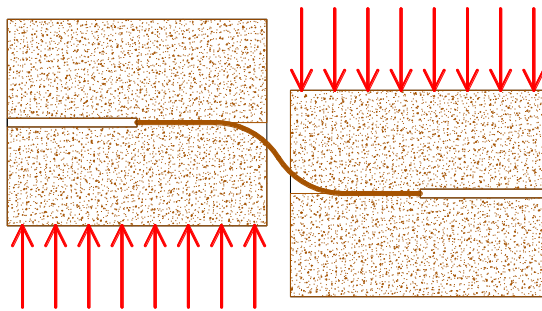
Laboratory shear test sample without bolt failure due to full bolt de-bonding
